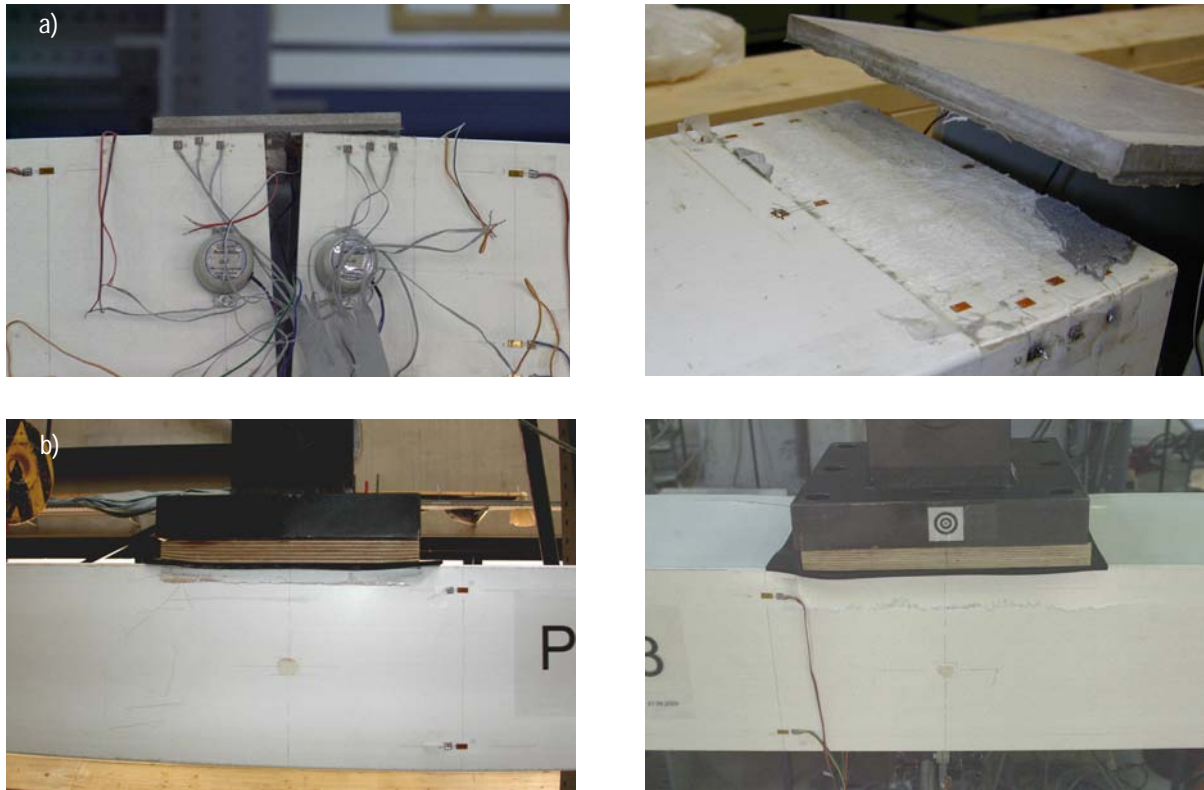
Failure of beam PH3 (a) joint failure, (b) East and West sides of span failure
